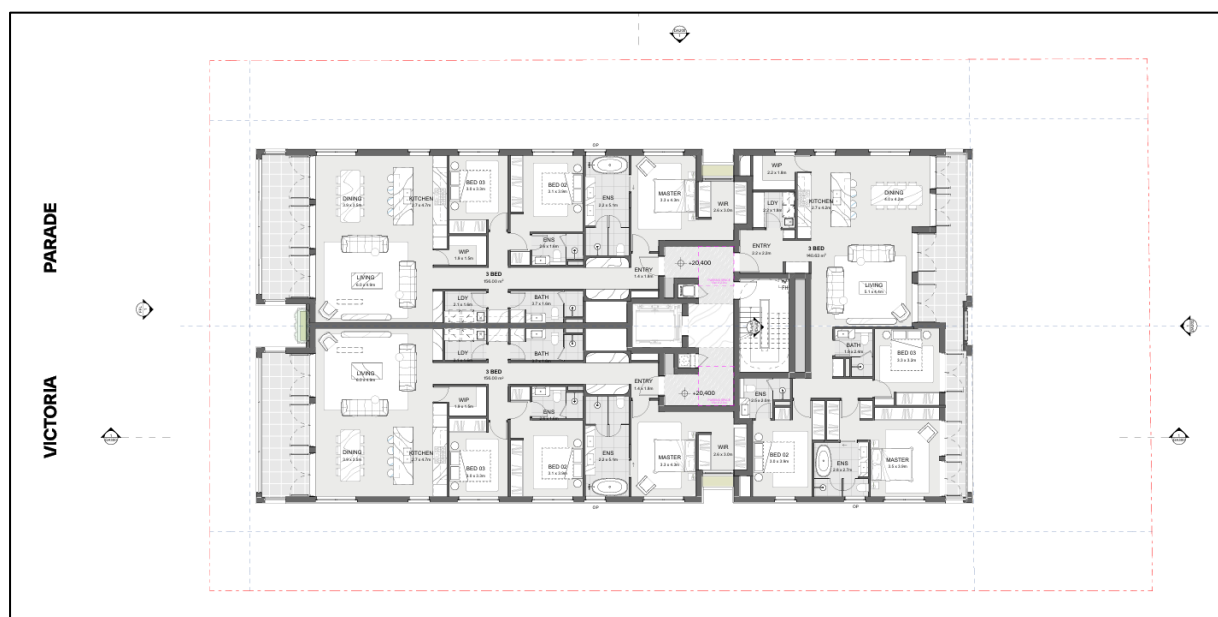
Floor Plan for Level 5 (Source: PBD Architects, 2026)
